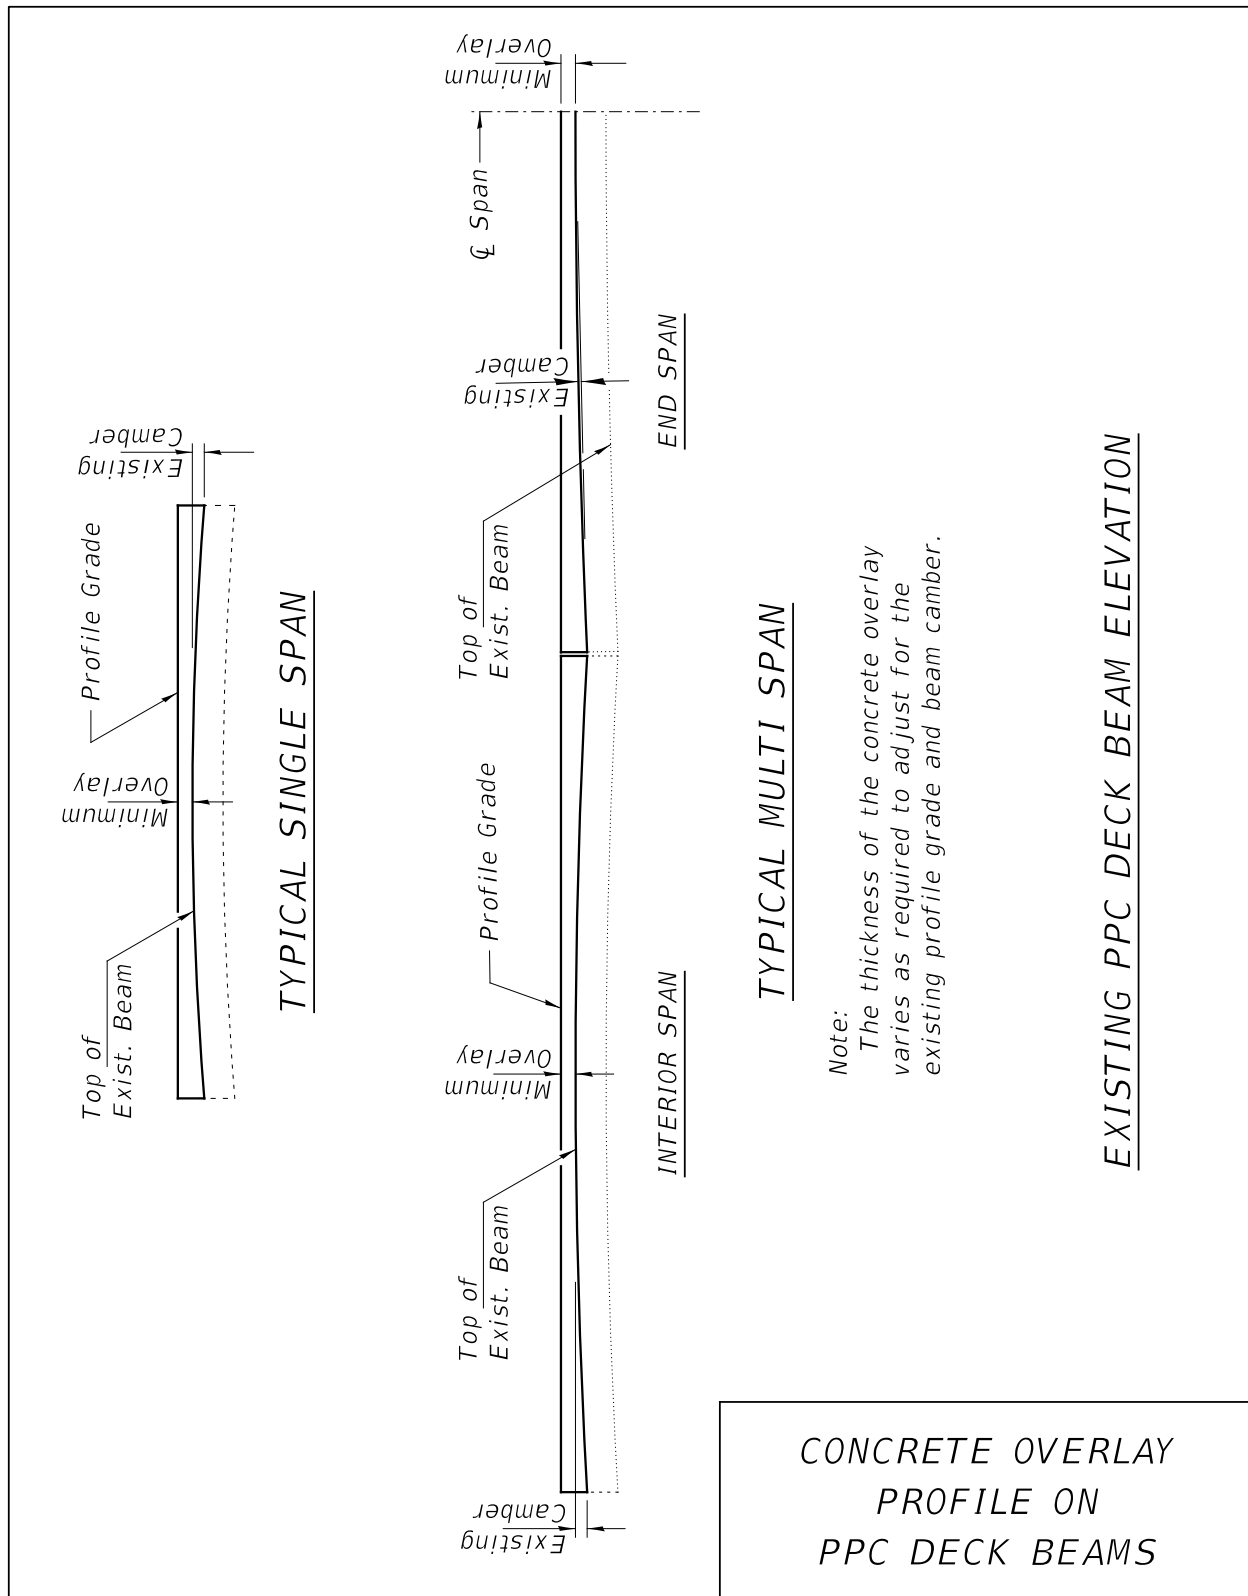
Concrete Overlay Profile on PPC Deck Beams
